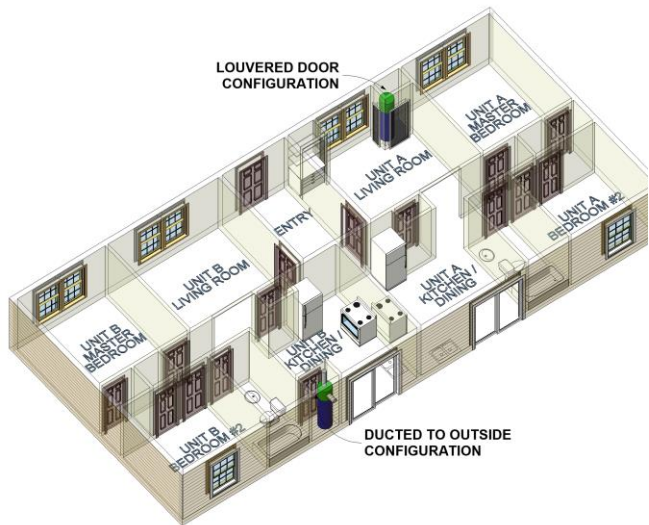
Shows 2 possible configurations in 3 D Unit A has a louvered door and Unit B is ducted to the outside.
